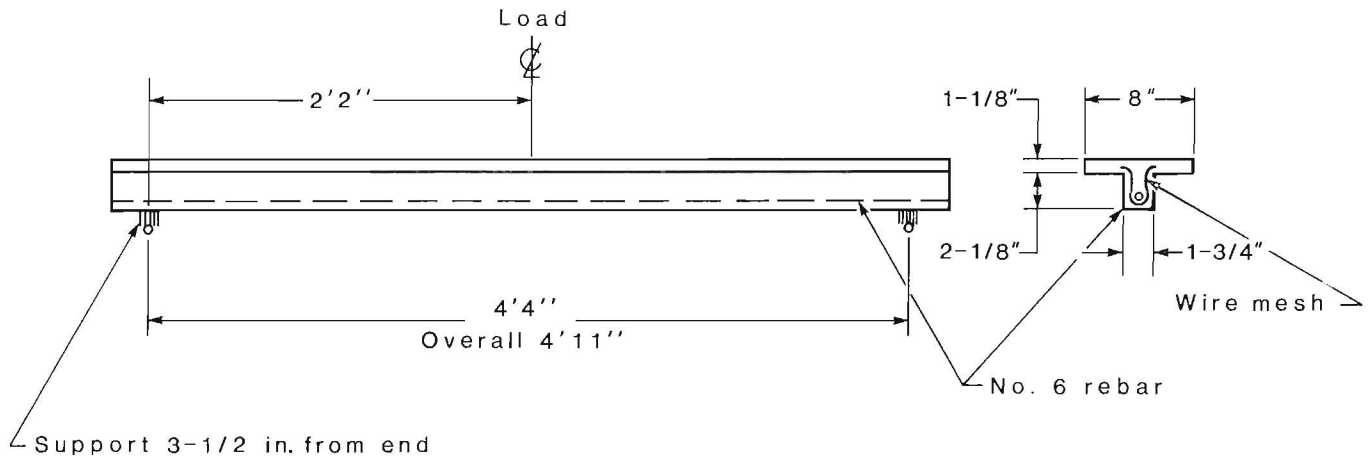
Gob lagging construction and testing, 2615 grizzly level.
